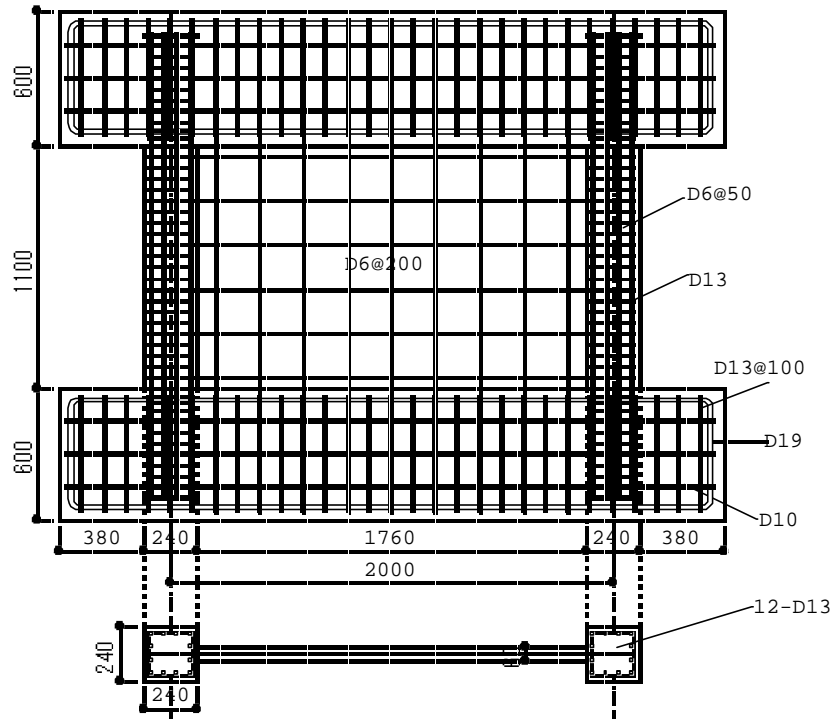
Details of specimens for horizontal loading test (WN, WV and WL)
